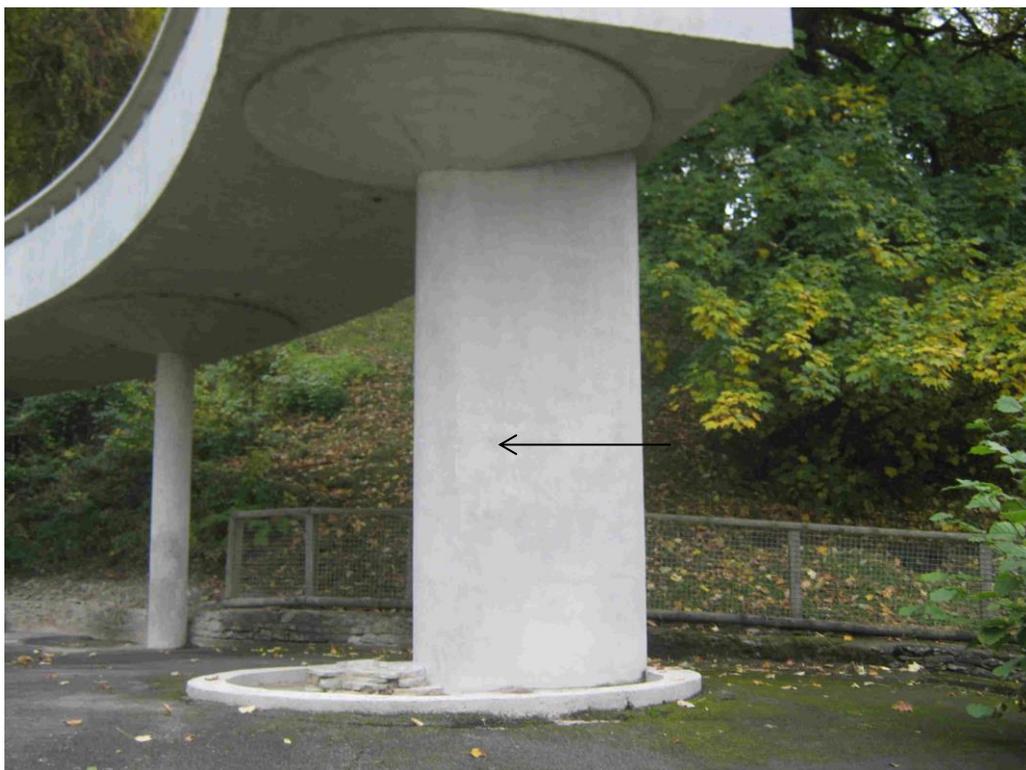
First pillar on Bear Ravine – showing vertical crack on repaired front face.
